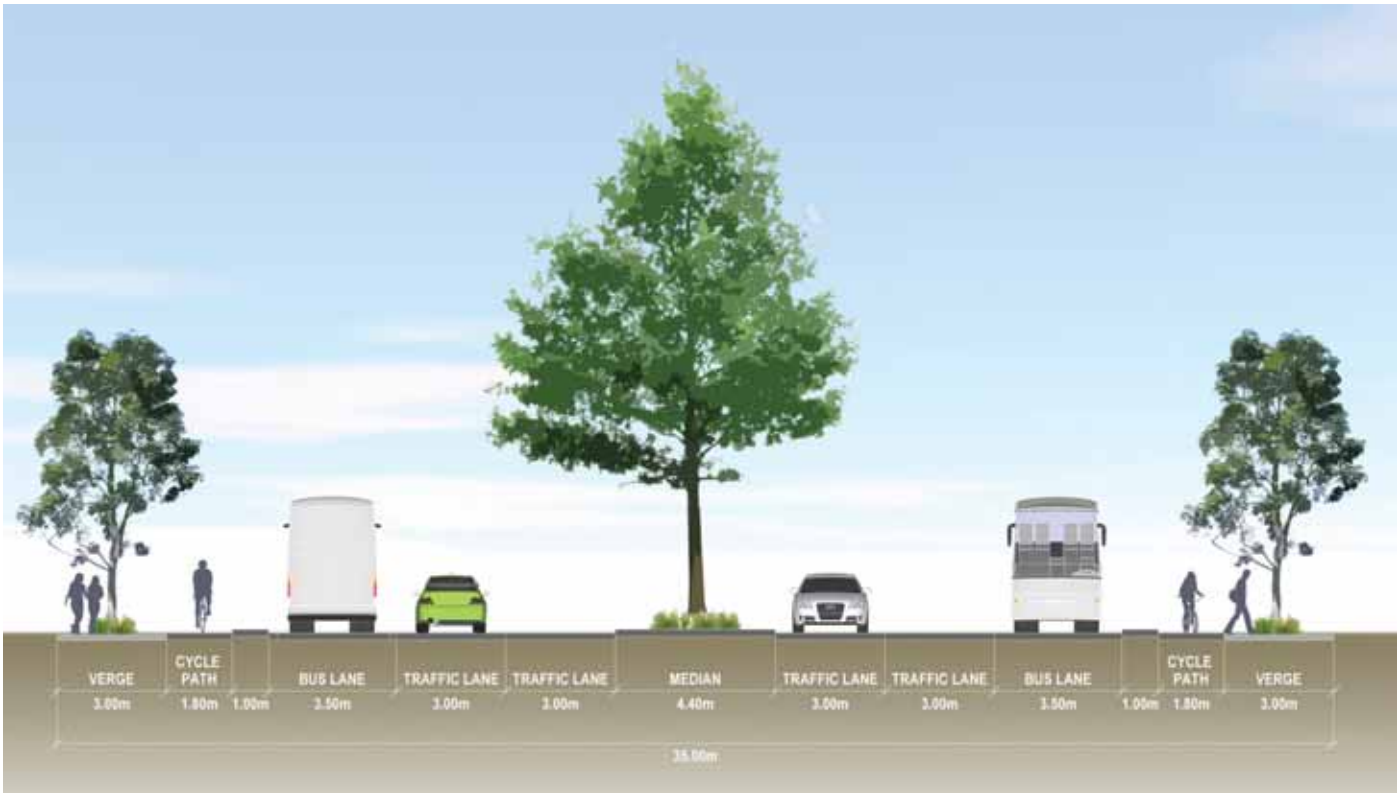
Stephenson Avenue Conceptual Cross Section – Freeway to Guthrie Street
